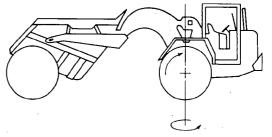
TWO AXLES, FRONT-AXLE DRIVE
